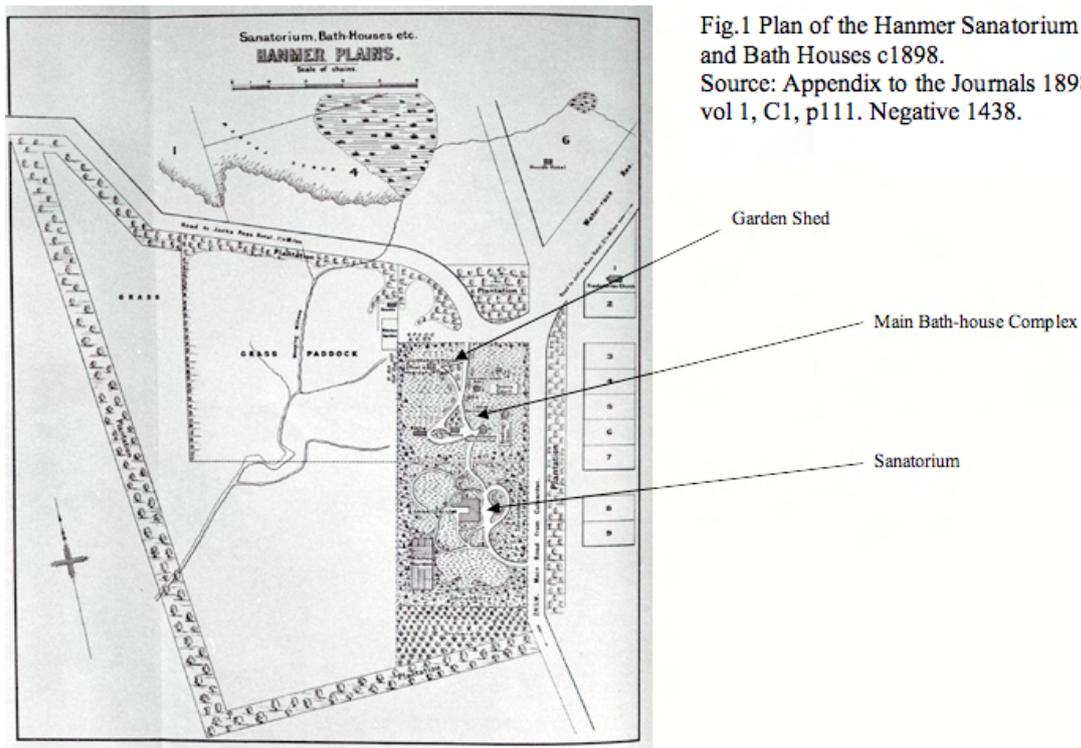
Plan of the Hanmer Sanatorium and Bath Houses c1898.
